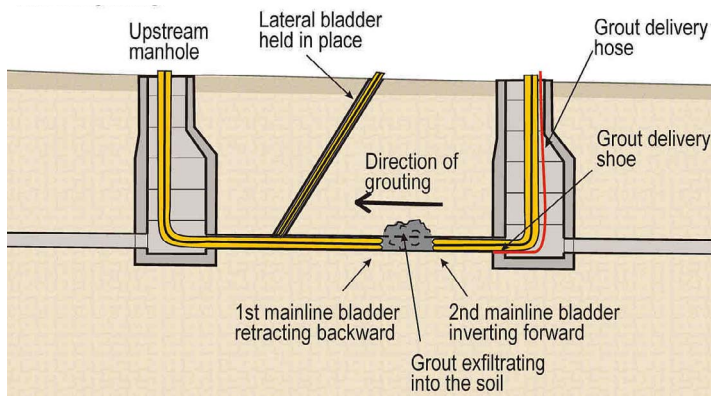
Mainline Grouting—Slug of Cement Grout Moving Towards Upstream Manhole.
